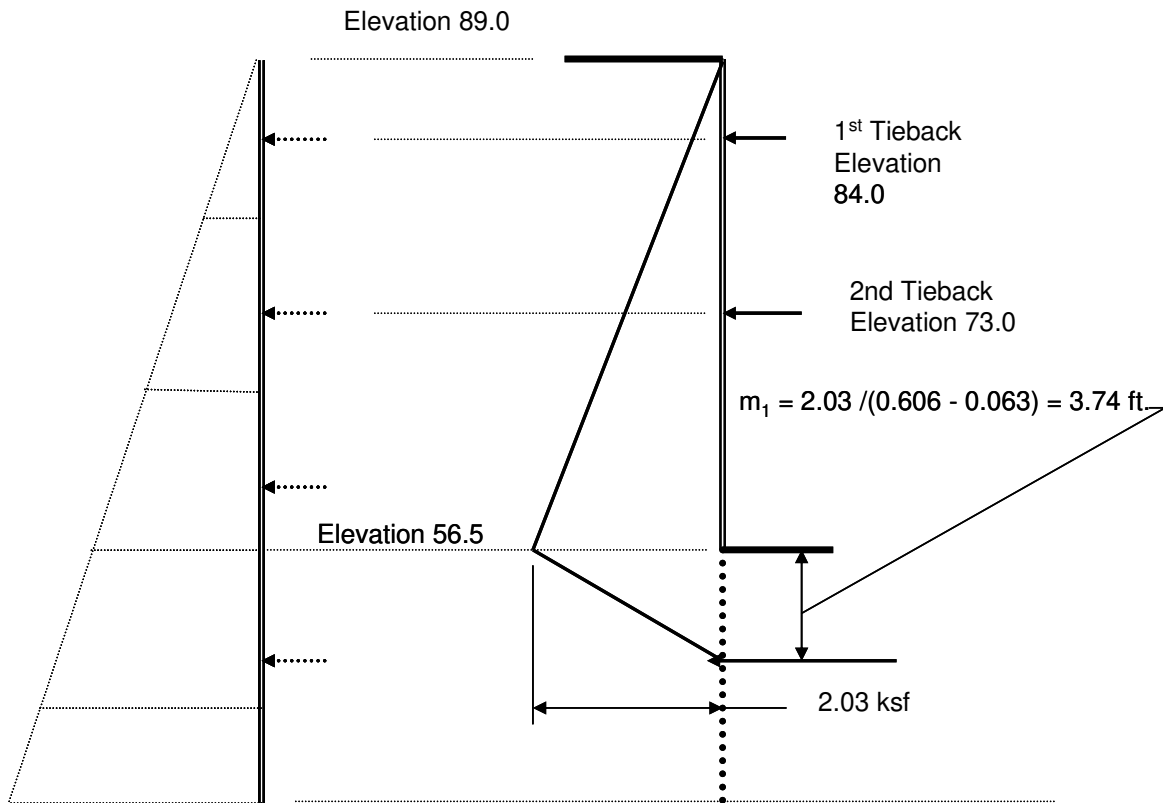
Excavate to elevation 56.5 – third stage excavation
